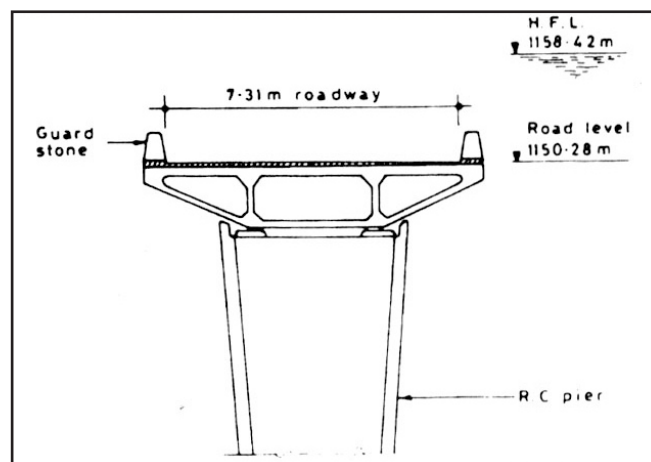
Cross section of deck of Krishna bridge at Deodurg
